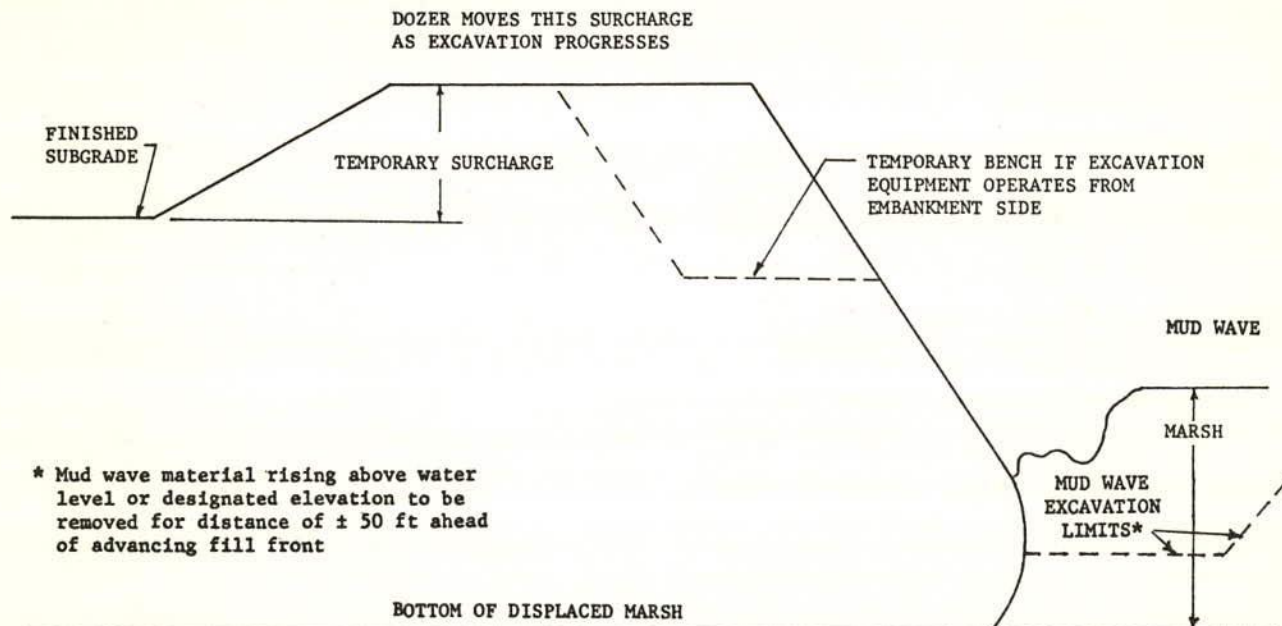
Longitudinal section of marsh removal and embankment construction with surcharge.
